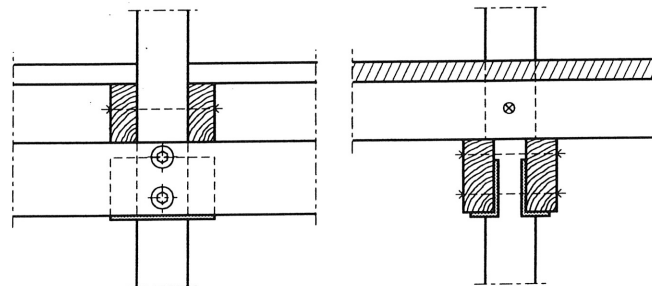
Double beam connected to indented columns using steel angles to increase bearing surface.
